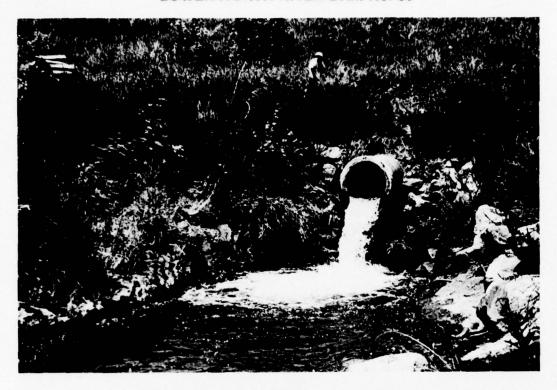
Principal Spillway Outlet - Stilling Basin
